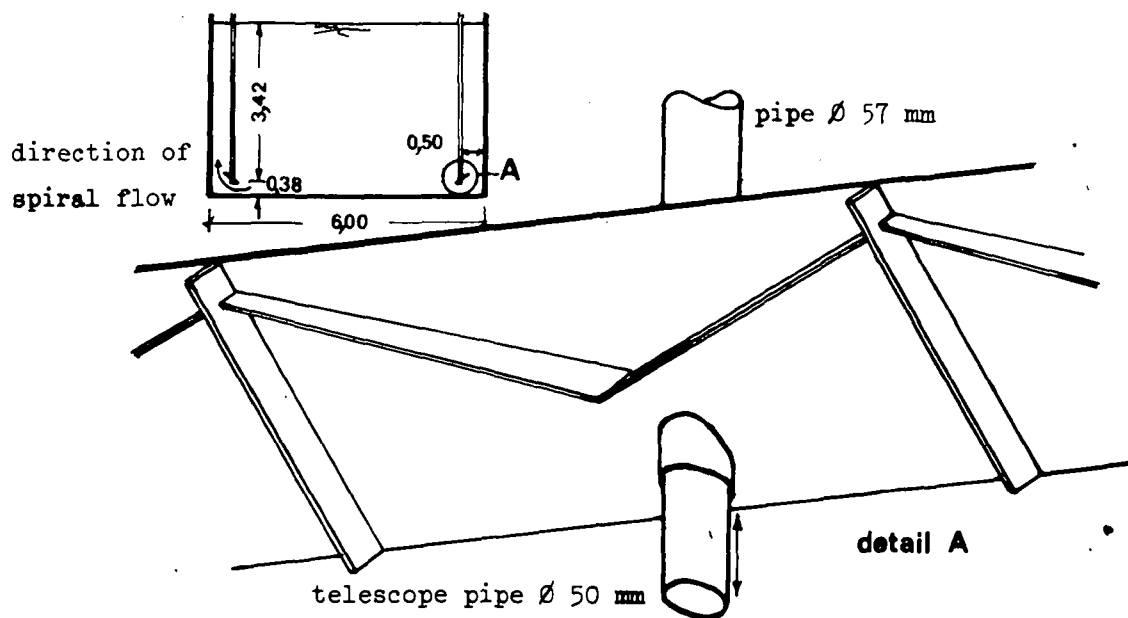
a DEFLECTING PLATE FOR DISINTEGRATION OF COARSE BUBBLES
